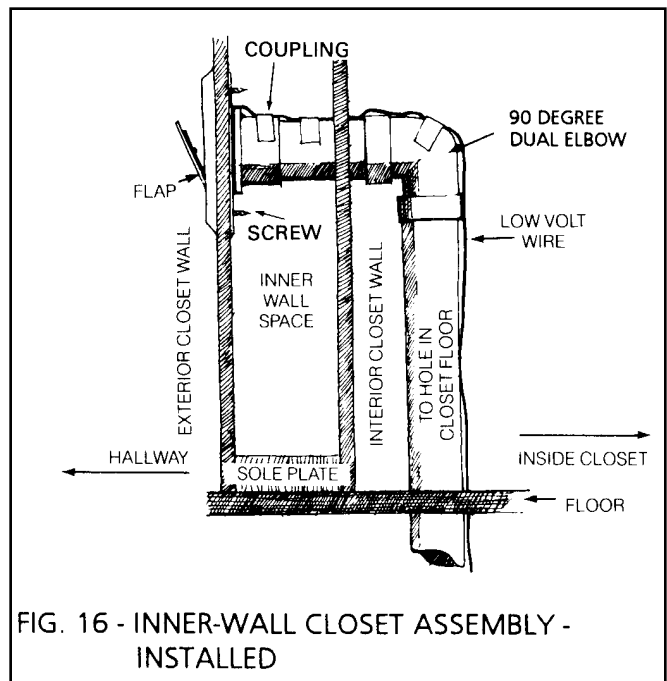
INNER-WALL CLOSET ASSEMBLY - INSTALLED
